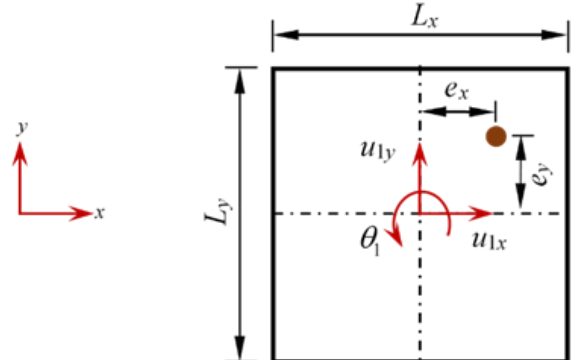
Plan view of Building 1 showing the imposed eccentricity.
